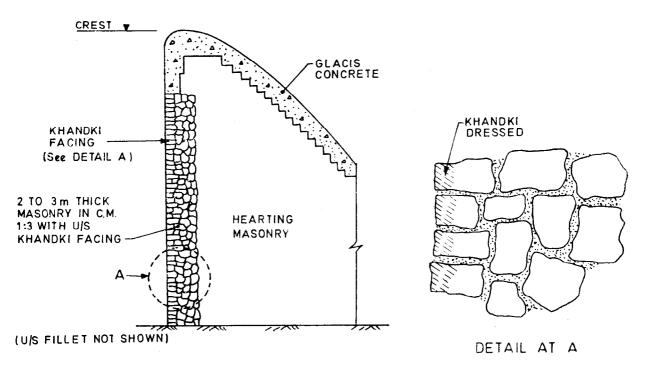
KHANDKI FACING WITH RICH MASONRY ZONE ON UPSTREAM
